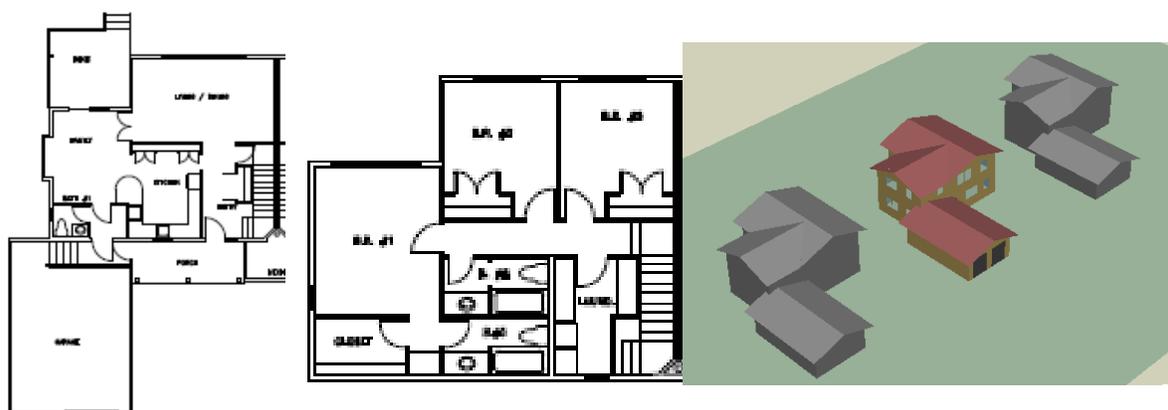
(a) The three bedroom duplex first floor plan, (b) second floor plan part, and (c) representative model layout of Figure 1.
